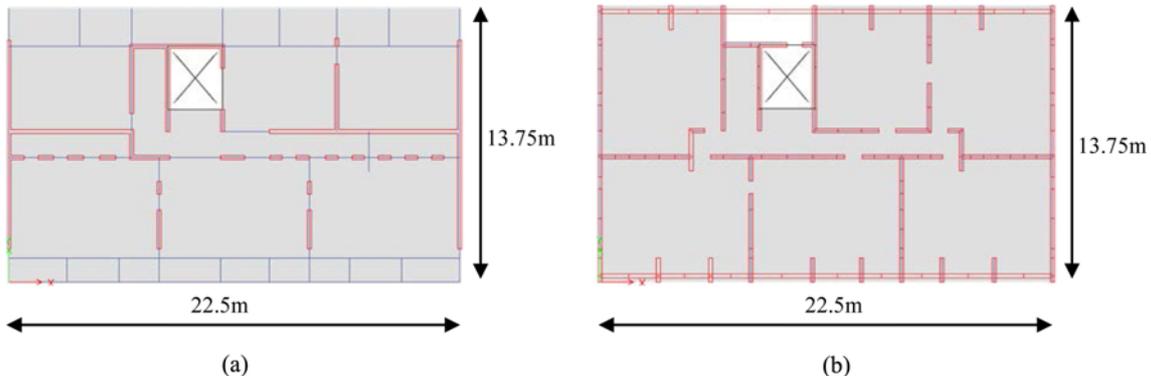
Ground Floor and Standard Floor - Type B Building: (a) Ground Floor - Type B Building, (b) Standard Floor - Type B Building
